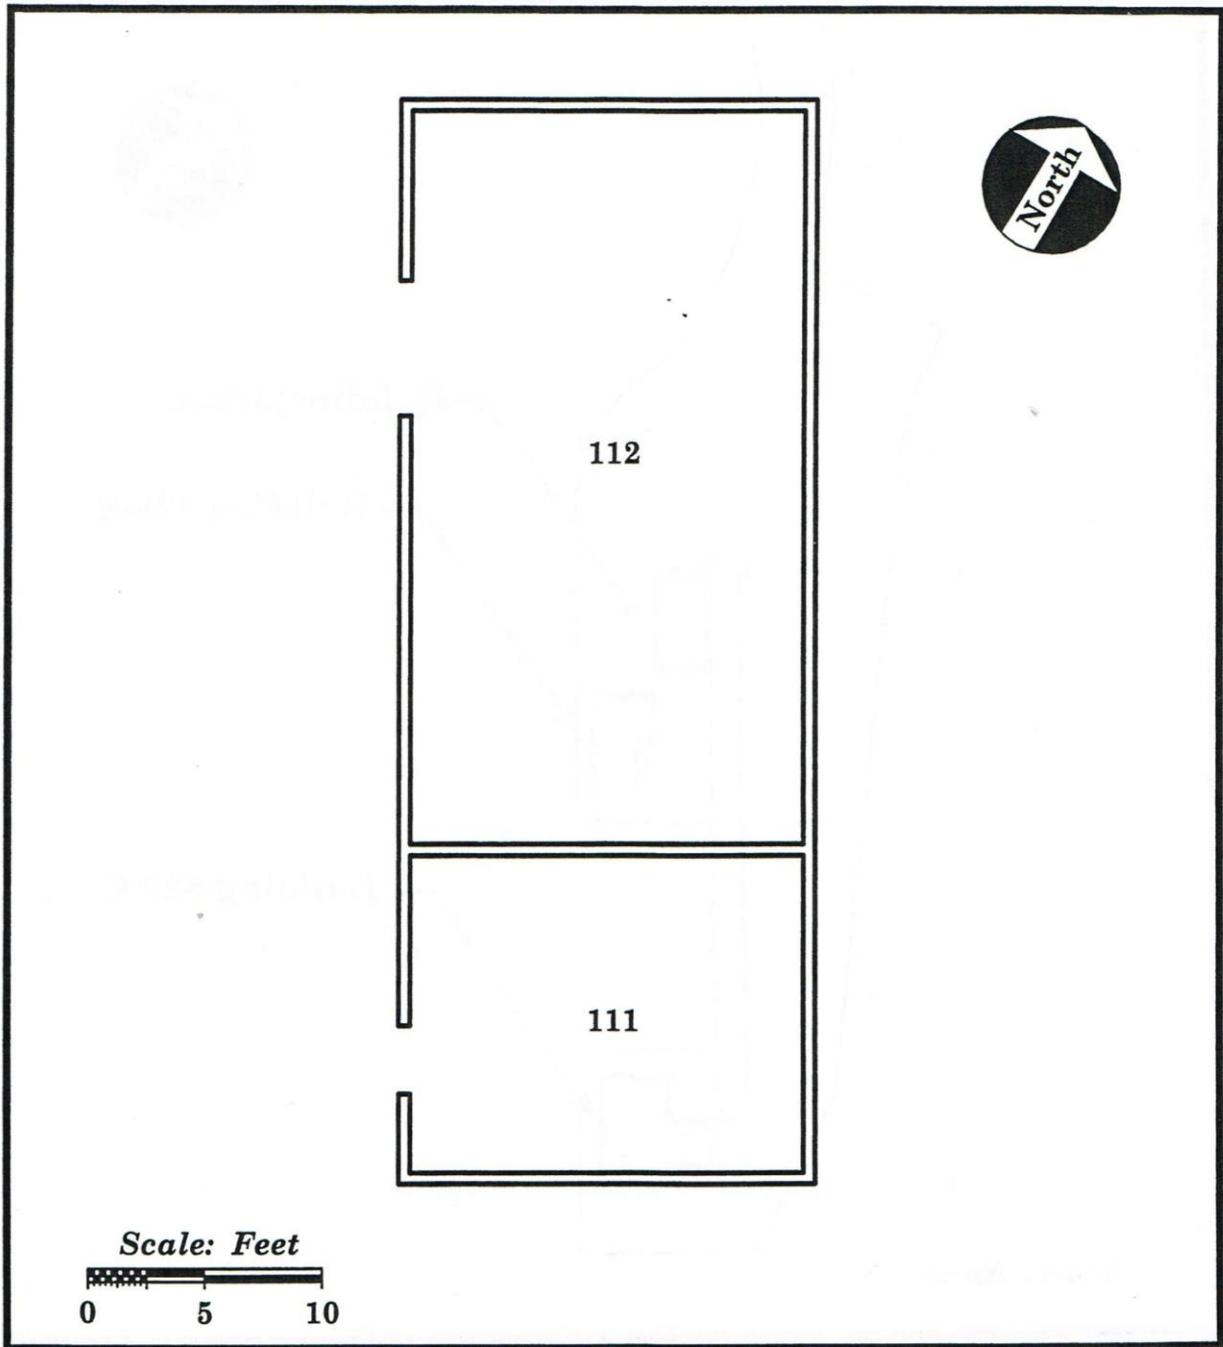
Building 817H, Facility Plot Plan, 1997. LLNL Archives, (Figure A-17)
